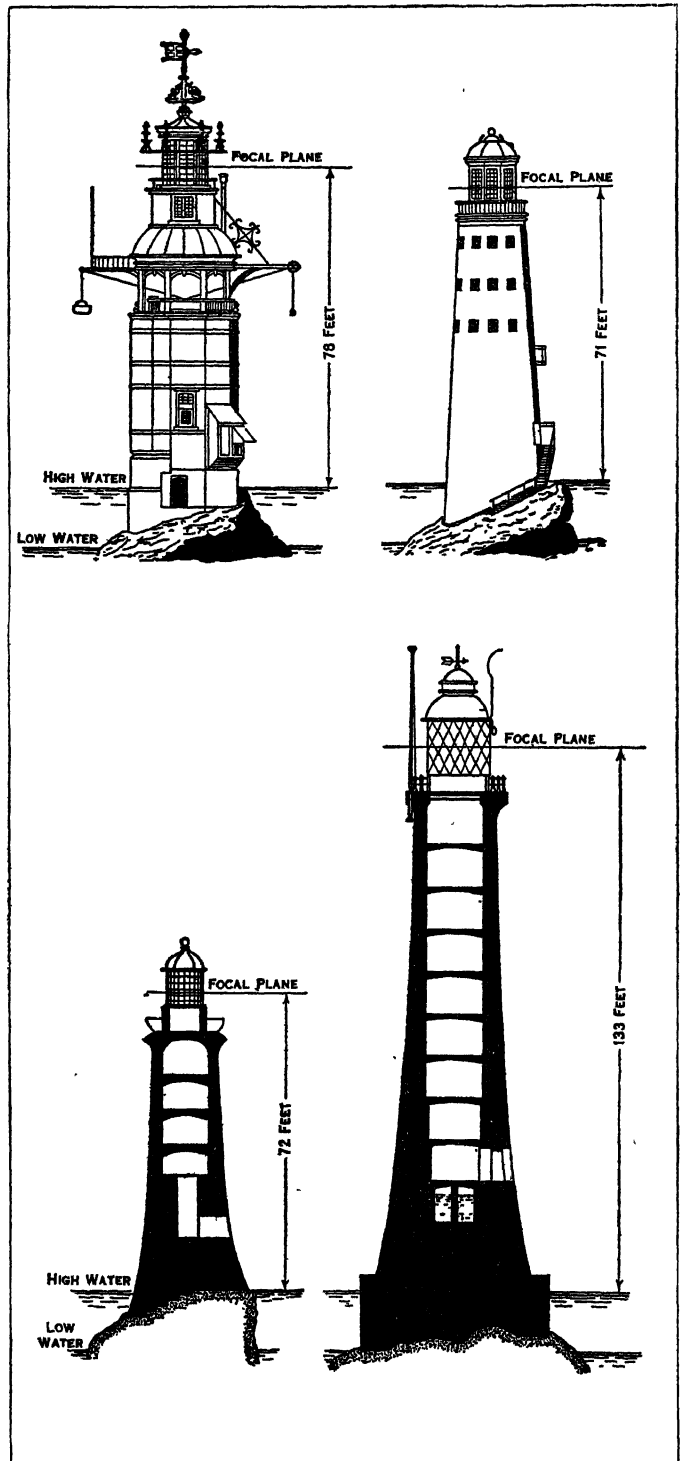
THE FOUR LIGHTHOUSES ON THE EDDYSTONE ROCKS. The towers are drawn to the same scale. The first tower was destroyed in the great storm of 1703, and the present tower was completed in 1882
